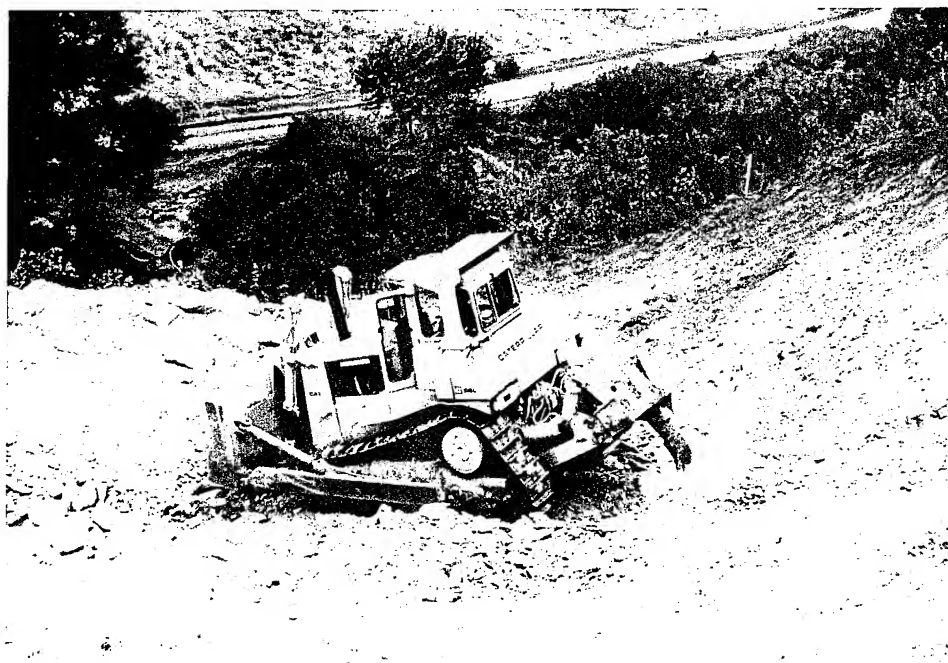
D-8 dozer attempting to rip hard rock on left abutment.
